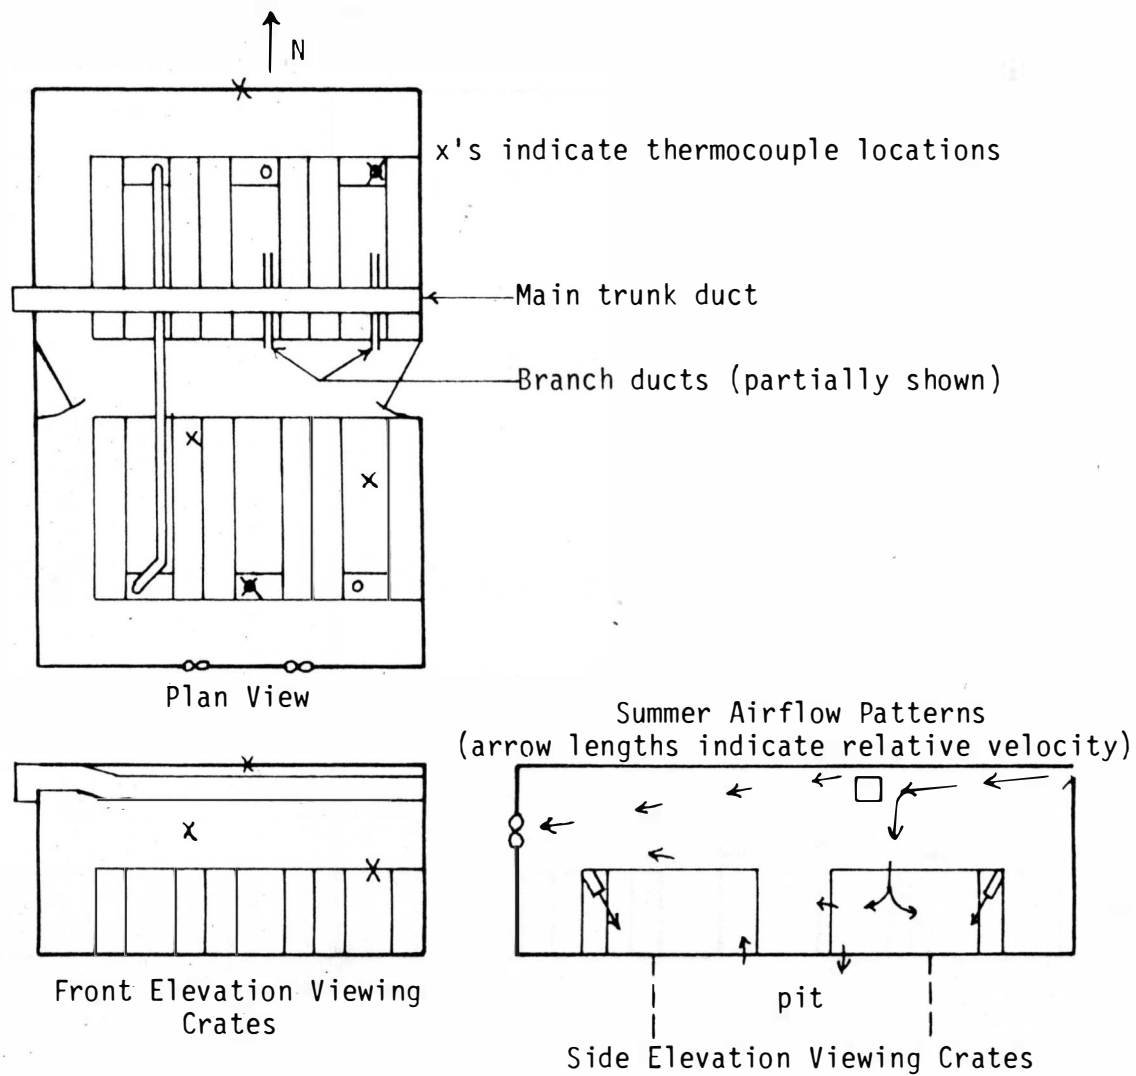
Snout ventilation room schematic showing floor plans, thermocouple locations and airflow patterns
